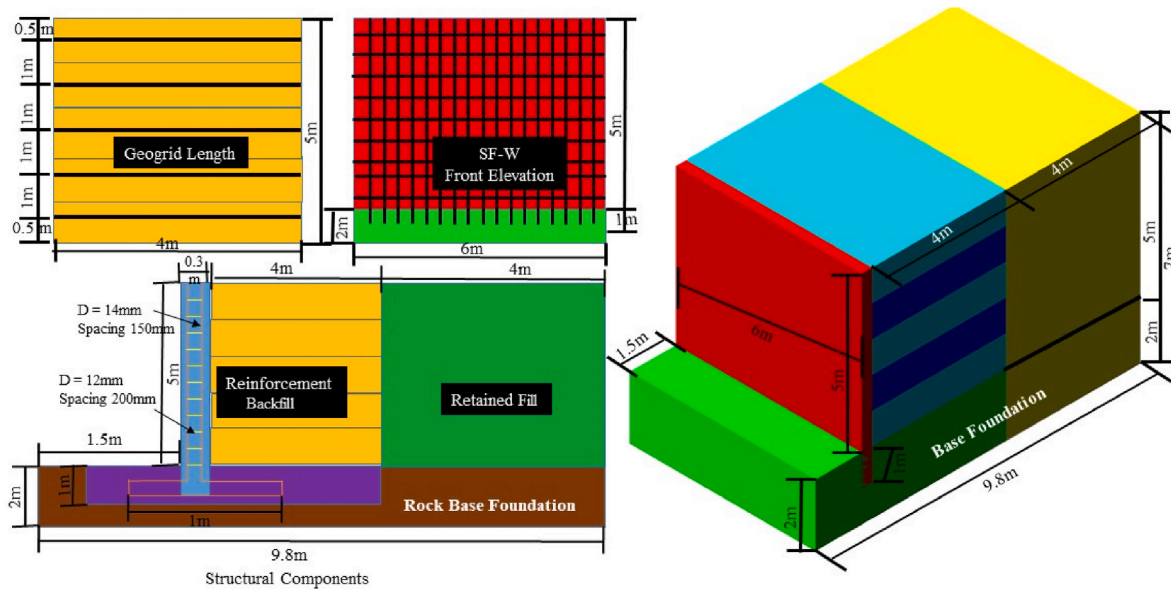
Complete overview of conventional reinforcement concrete GRE wall.
